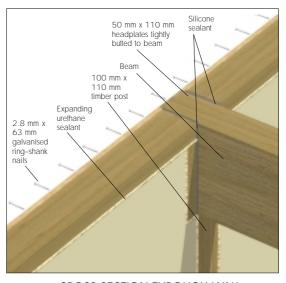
CROSS SECTION THROUGH WALL SHOWING INSTALLED BEAM
